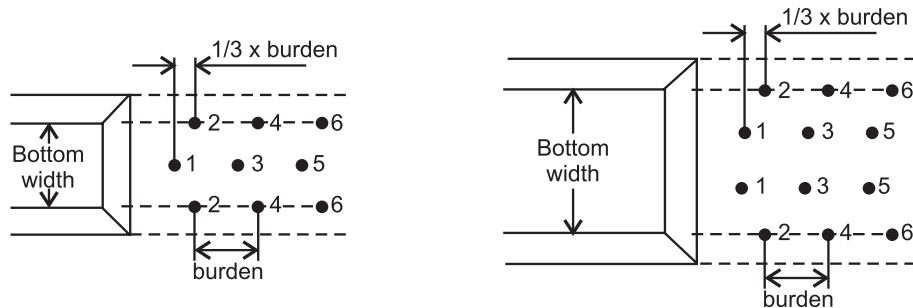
Trench drilling, charging and firing (delay 25 ms) by conventional technique.
